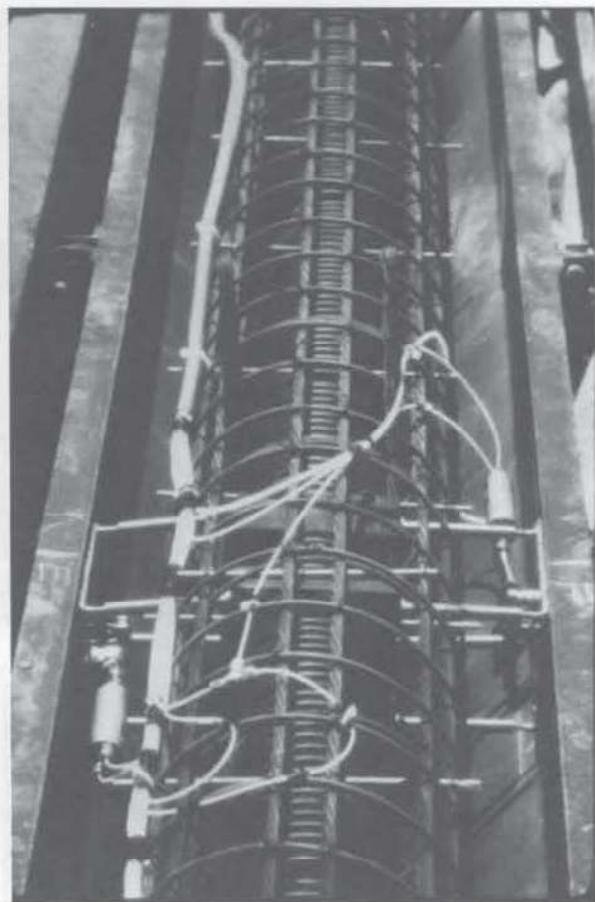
Pneumatic piezometer and earth pressure cell on opposite faces of precast concrete pile, prior to concreting. Keehi Interchange, Honolulu, HI, 1977.
